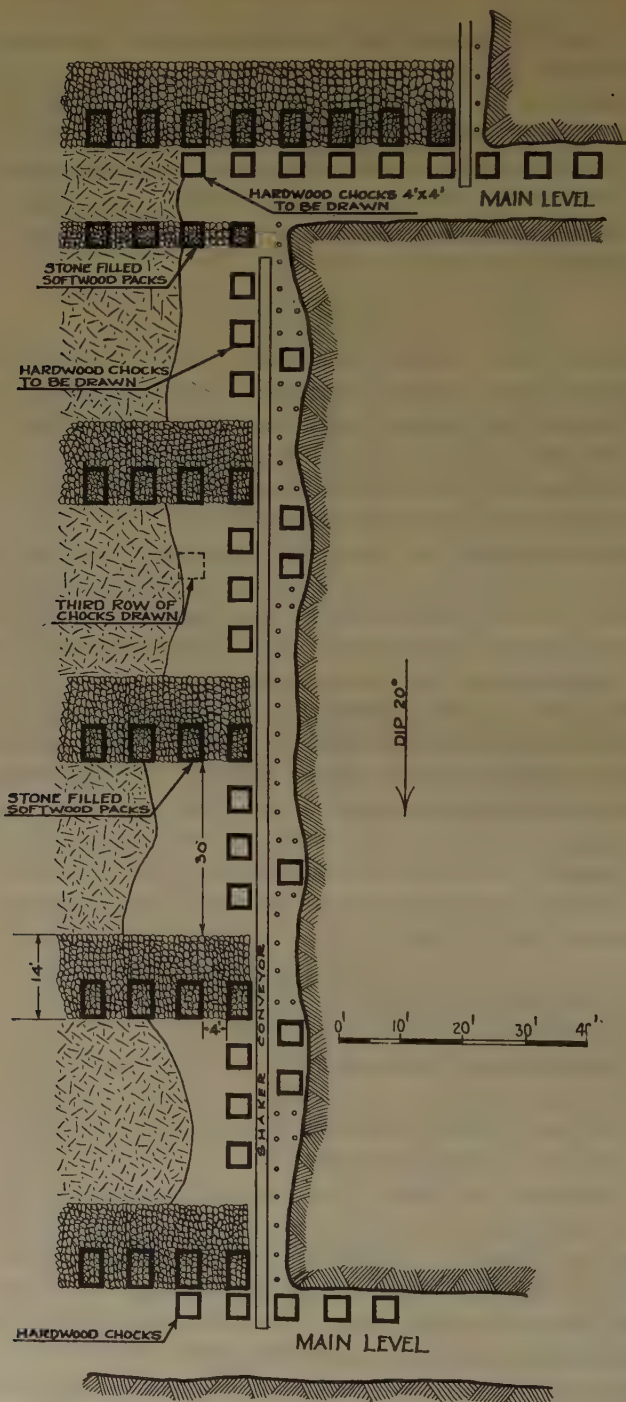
SYSTEM OF ROOF SUPPORT ON LONGWALL FACES.
